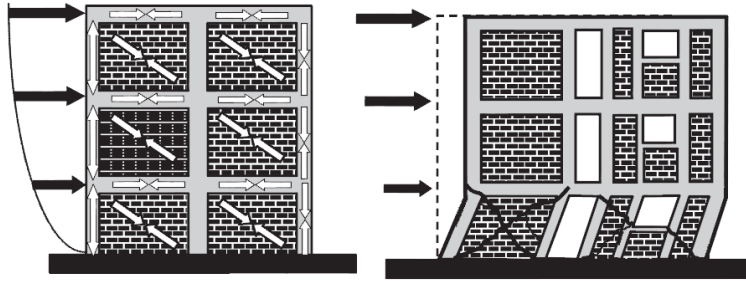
Confined masonry building modeled as a vertical truss [24].
